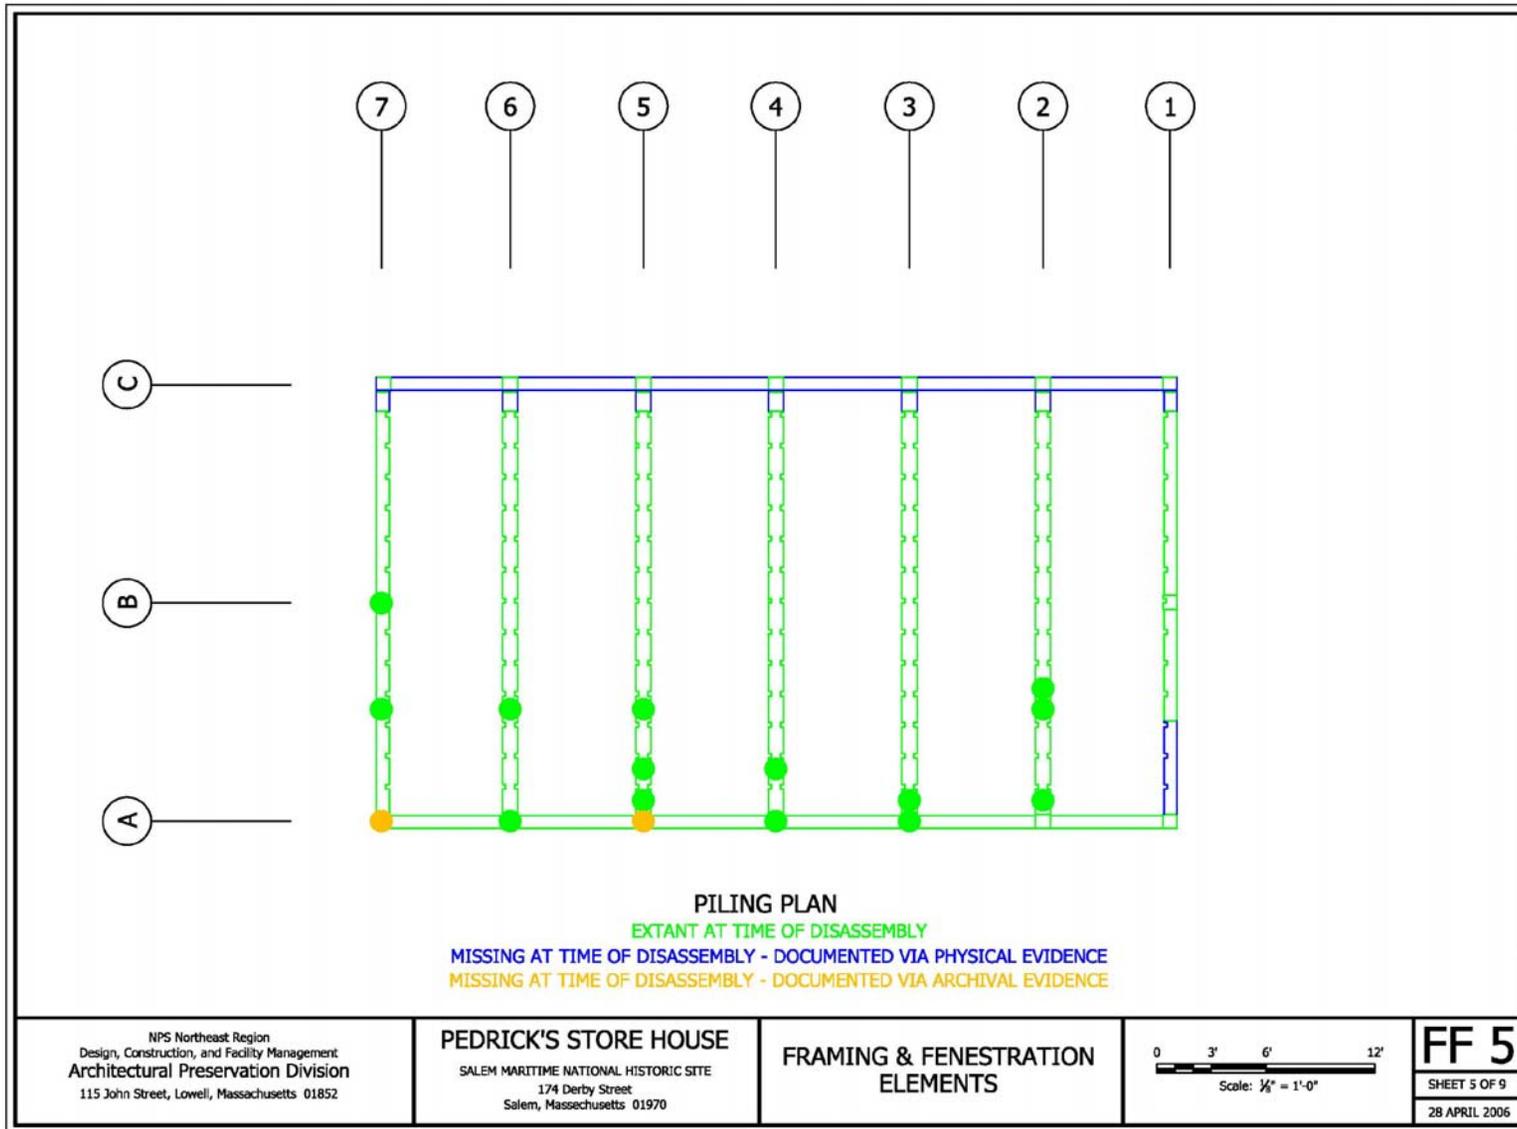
Measured drawing of framing and fenestration elements: Piling plan.
